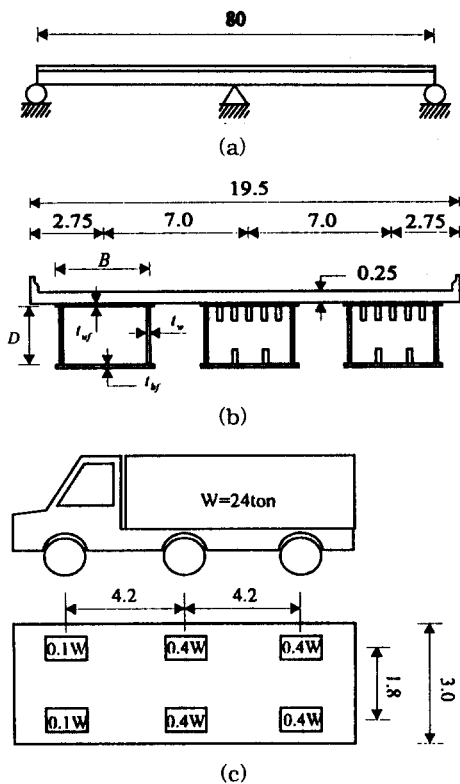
(a) Two-span continuous steel box girder bridge; (b) Cross section of Bridge; (c) Standard truck load (dimension in meter).
